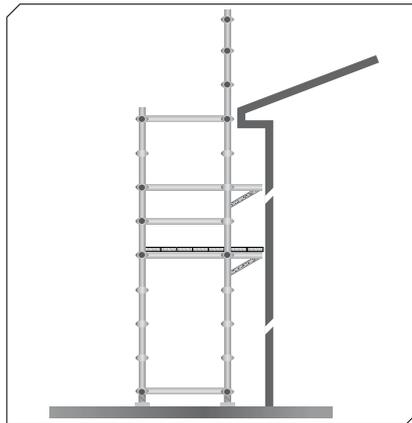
(e): Inside standards supporting guardrailing with hop-up bracket for other trades.
